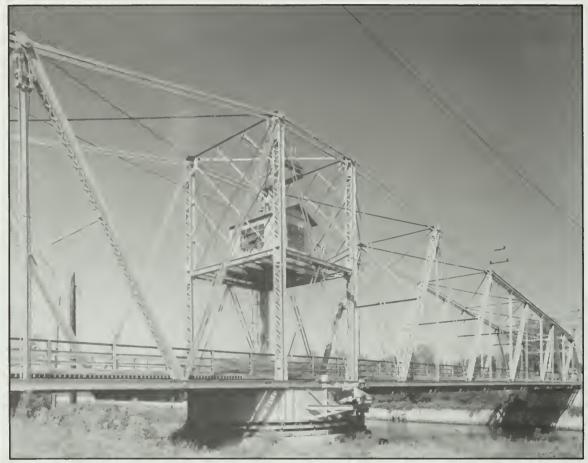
Romeo Road: Chicago Drainage Canal Bridge (1899), detail of center pier L and bridge tender's house, Romeoville (vicinity). Photo by Martin Stupich, HAER.
